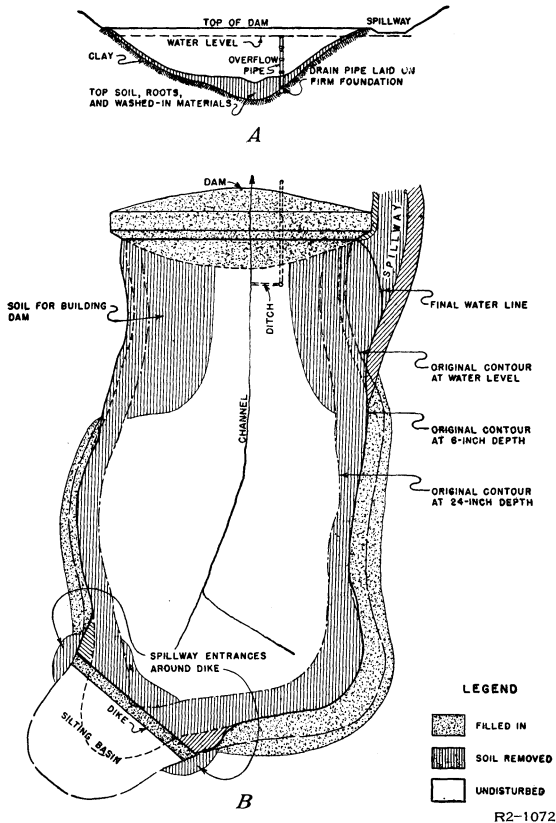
Proper location of a drain pipe and the areas from which soil should be removed for the dam are important when constructing new ponds. *A*, The relative elevations of drain pipe, clay subsoil, porous soil material, water level, spillway, and top of dam. *B*, Areas to be cut and filled, including deepening the edges and diking.
